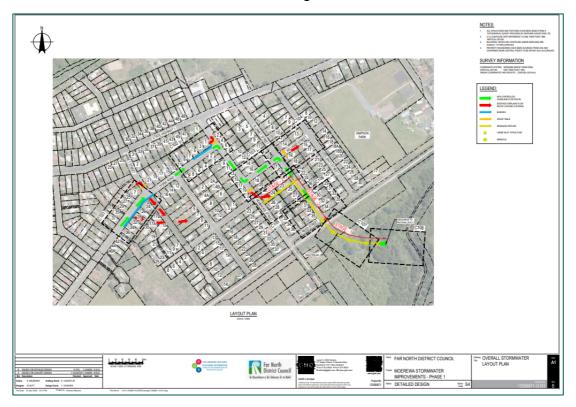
Locality plan. Source: GHD (refer to Appendix 3 for scaled plans).
